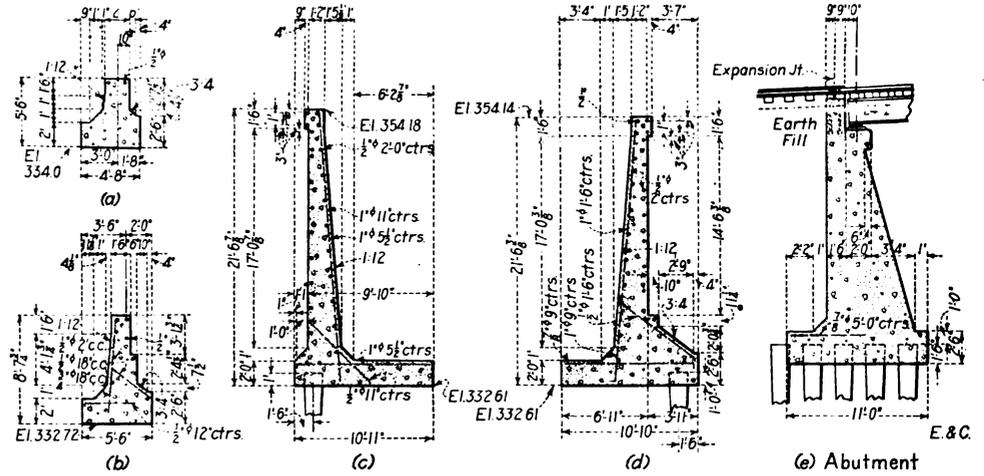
Cross Sections Showing Types of Retaining Walls and Abutment Used in West Approach of East Kansas Ave. Bridge.
